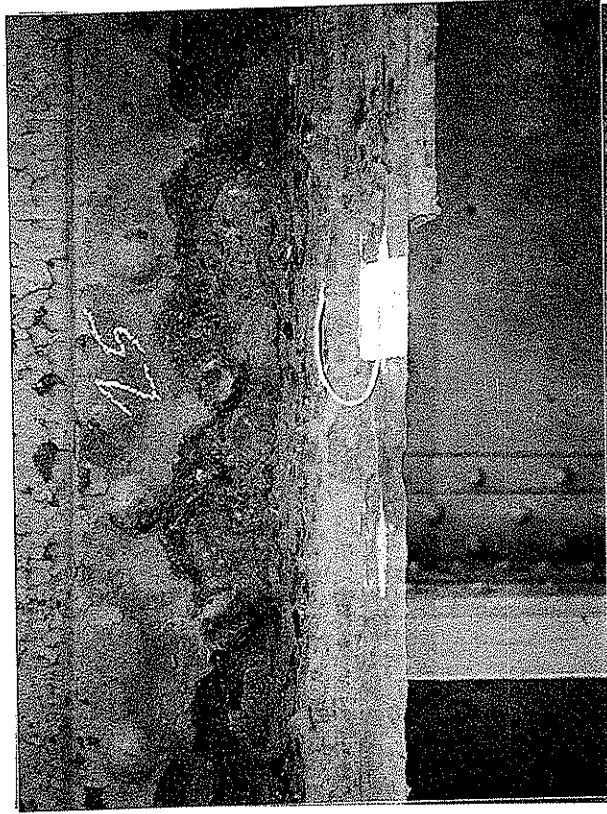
Span 10, North side of Floorbeam 10, Gage Installations 18 to 23
